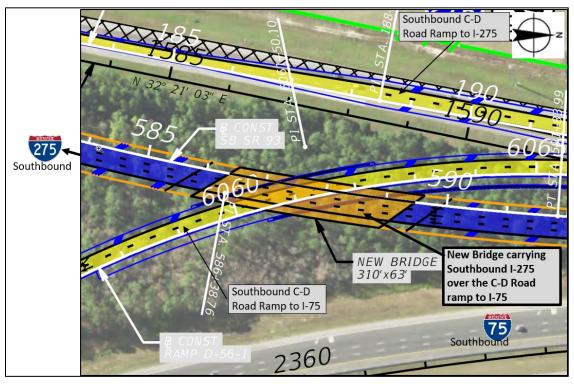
New Bridge-I-275 over C-D Road Ramp to I-75
